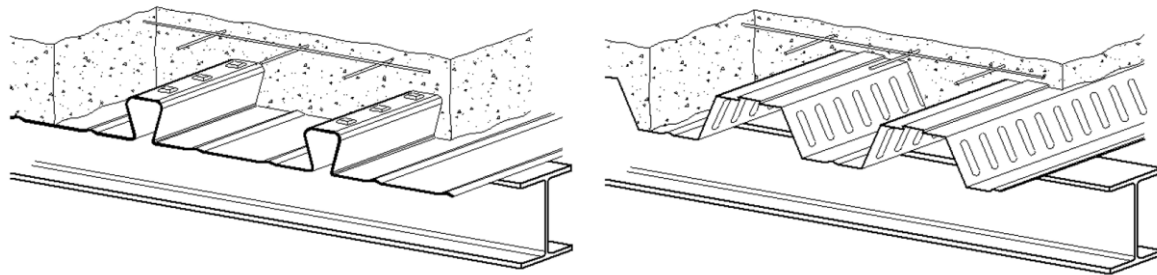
Re-entrant (left) and trapezoidal (right) steel sheeting [2].
